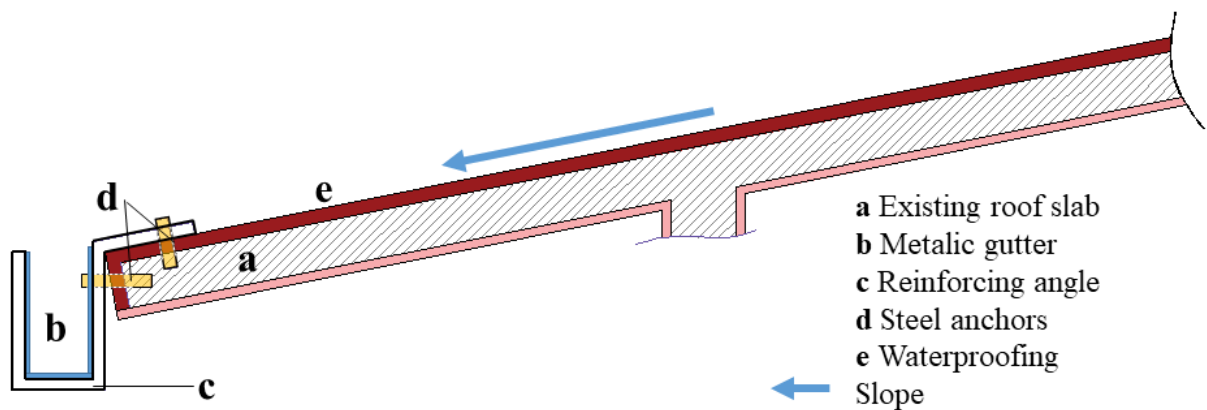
Roof slab retrofitting using a metal gutter without modifying the top slab in the pattern single-family household.
